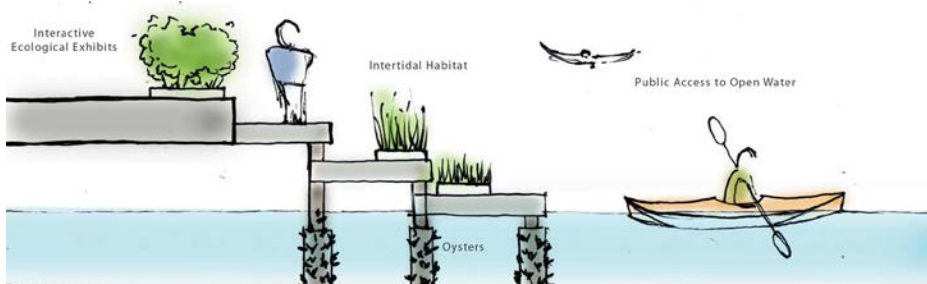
Conceptual section drawing of eco-park at the pier's edge.
